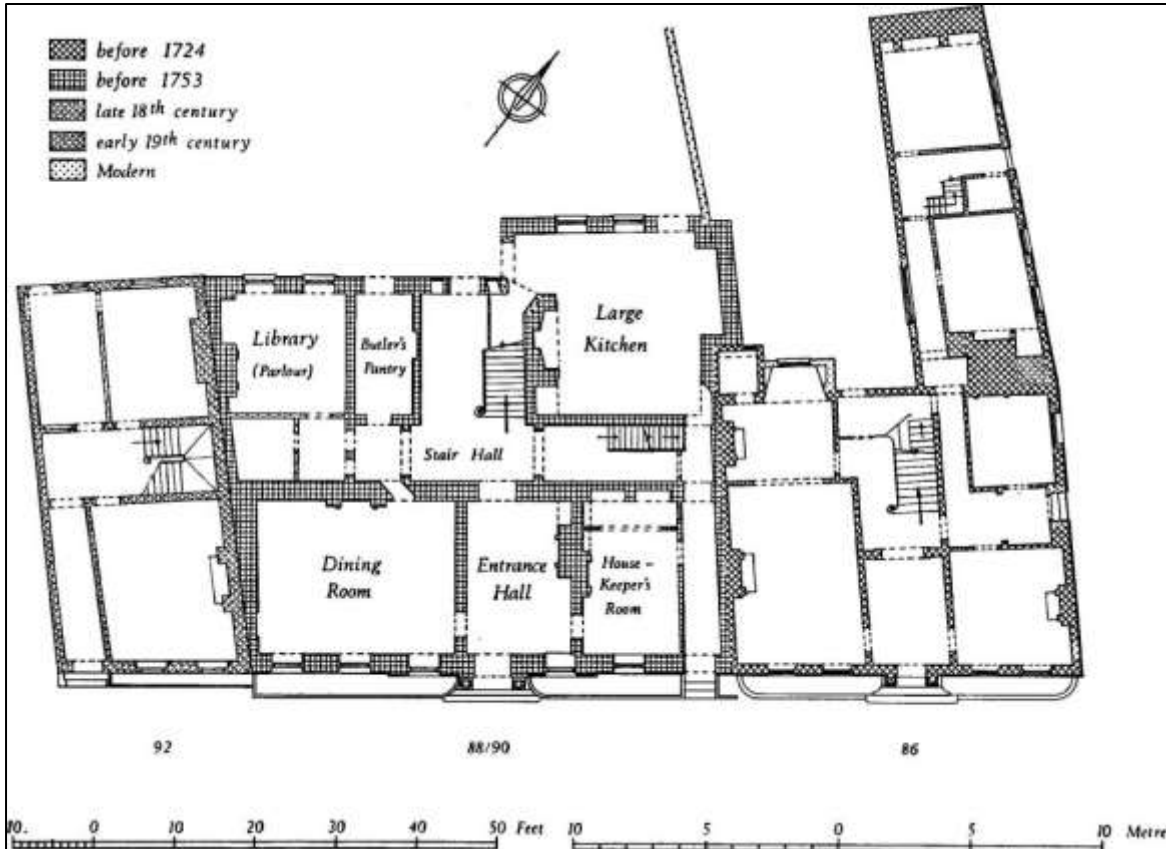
Ground floor plan with phasing for nos.86, 88-90 & 92 Micklegate (© RCHME, figure 68)
